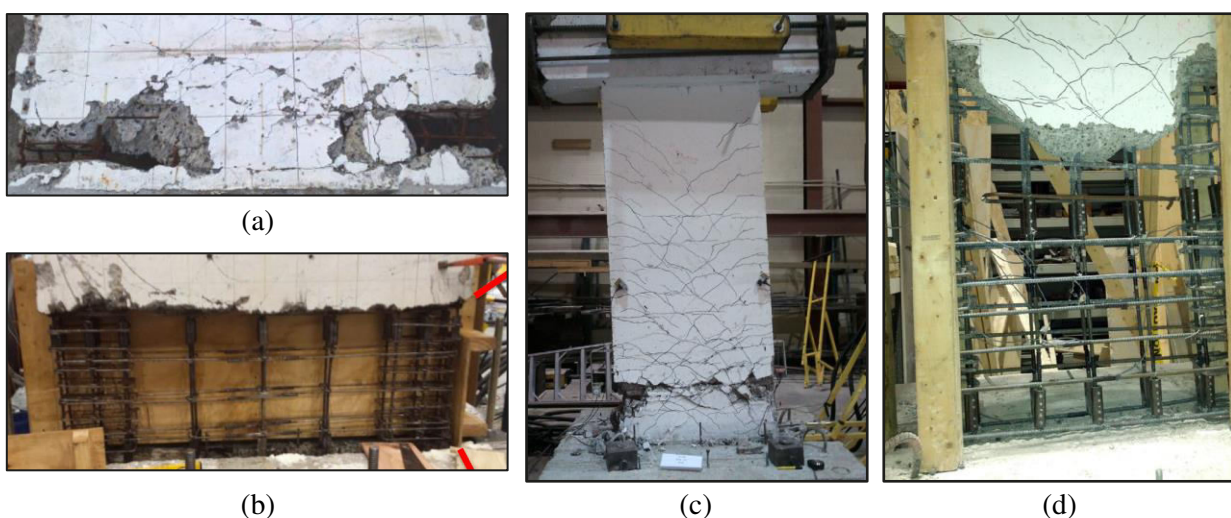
Repair procedures. (a) Damage before repair in wall M5-R (Motter et al., 2017) (b) Steel replacement in wall M5-R (Motter et al., 2017), (c) Damage before repair in wall RW1-SR (Cortes-Puentes et al., 2018), and (d) Steel replacement in wall RW1-SR (Cortes-Puentes et al., 2018).
